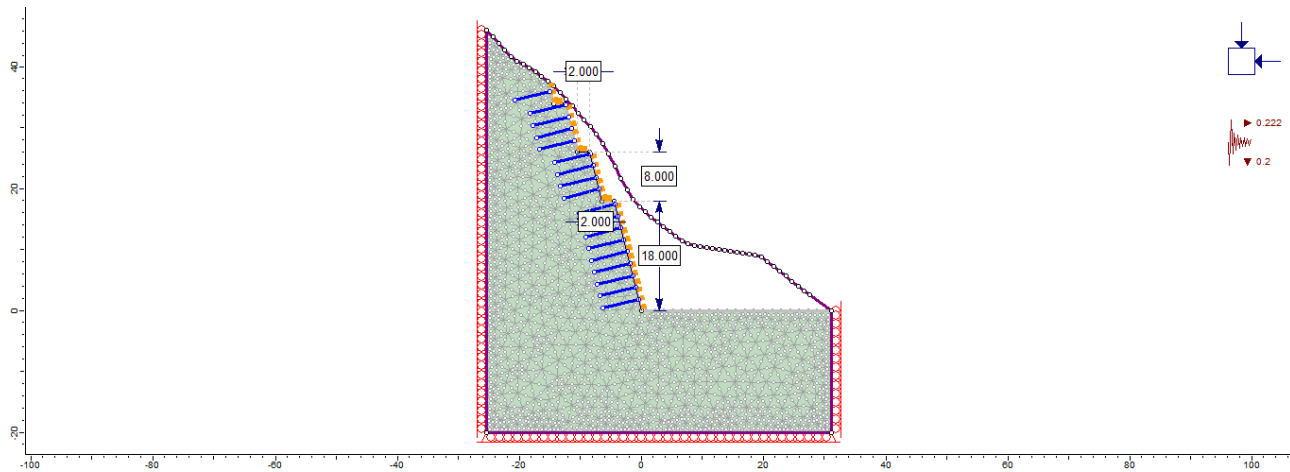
Excavated Slope of Spillway Tunnel Portal Modelled in Phase2 Software
